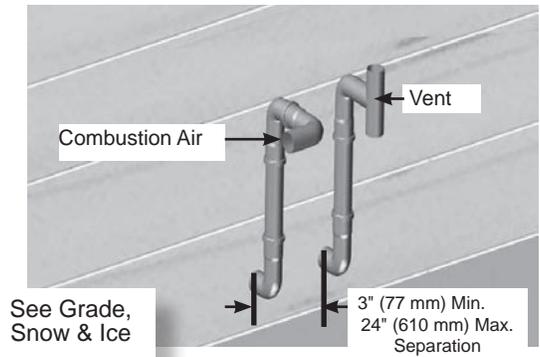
Twin Pipe Side Wall Vent
